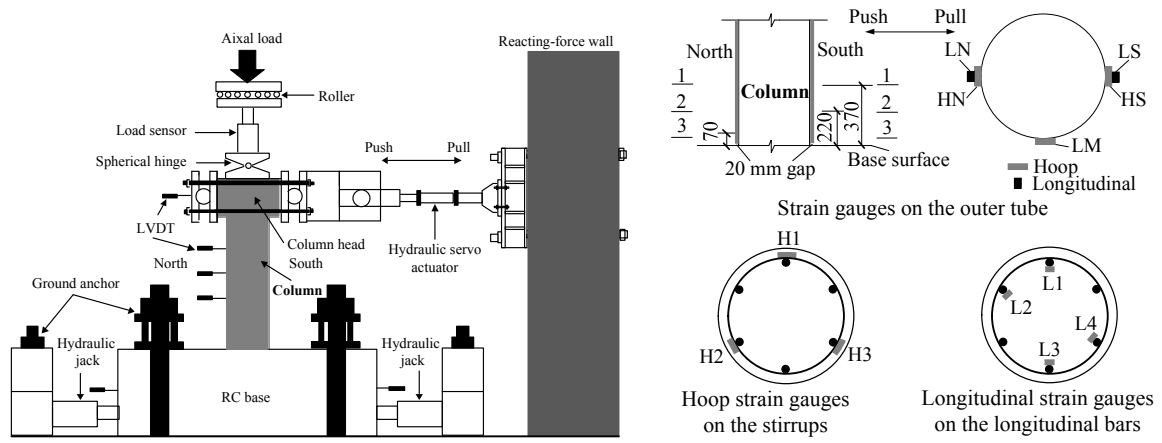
Test setup and layout of LVDTs and strain gauge (Units in mm)
